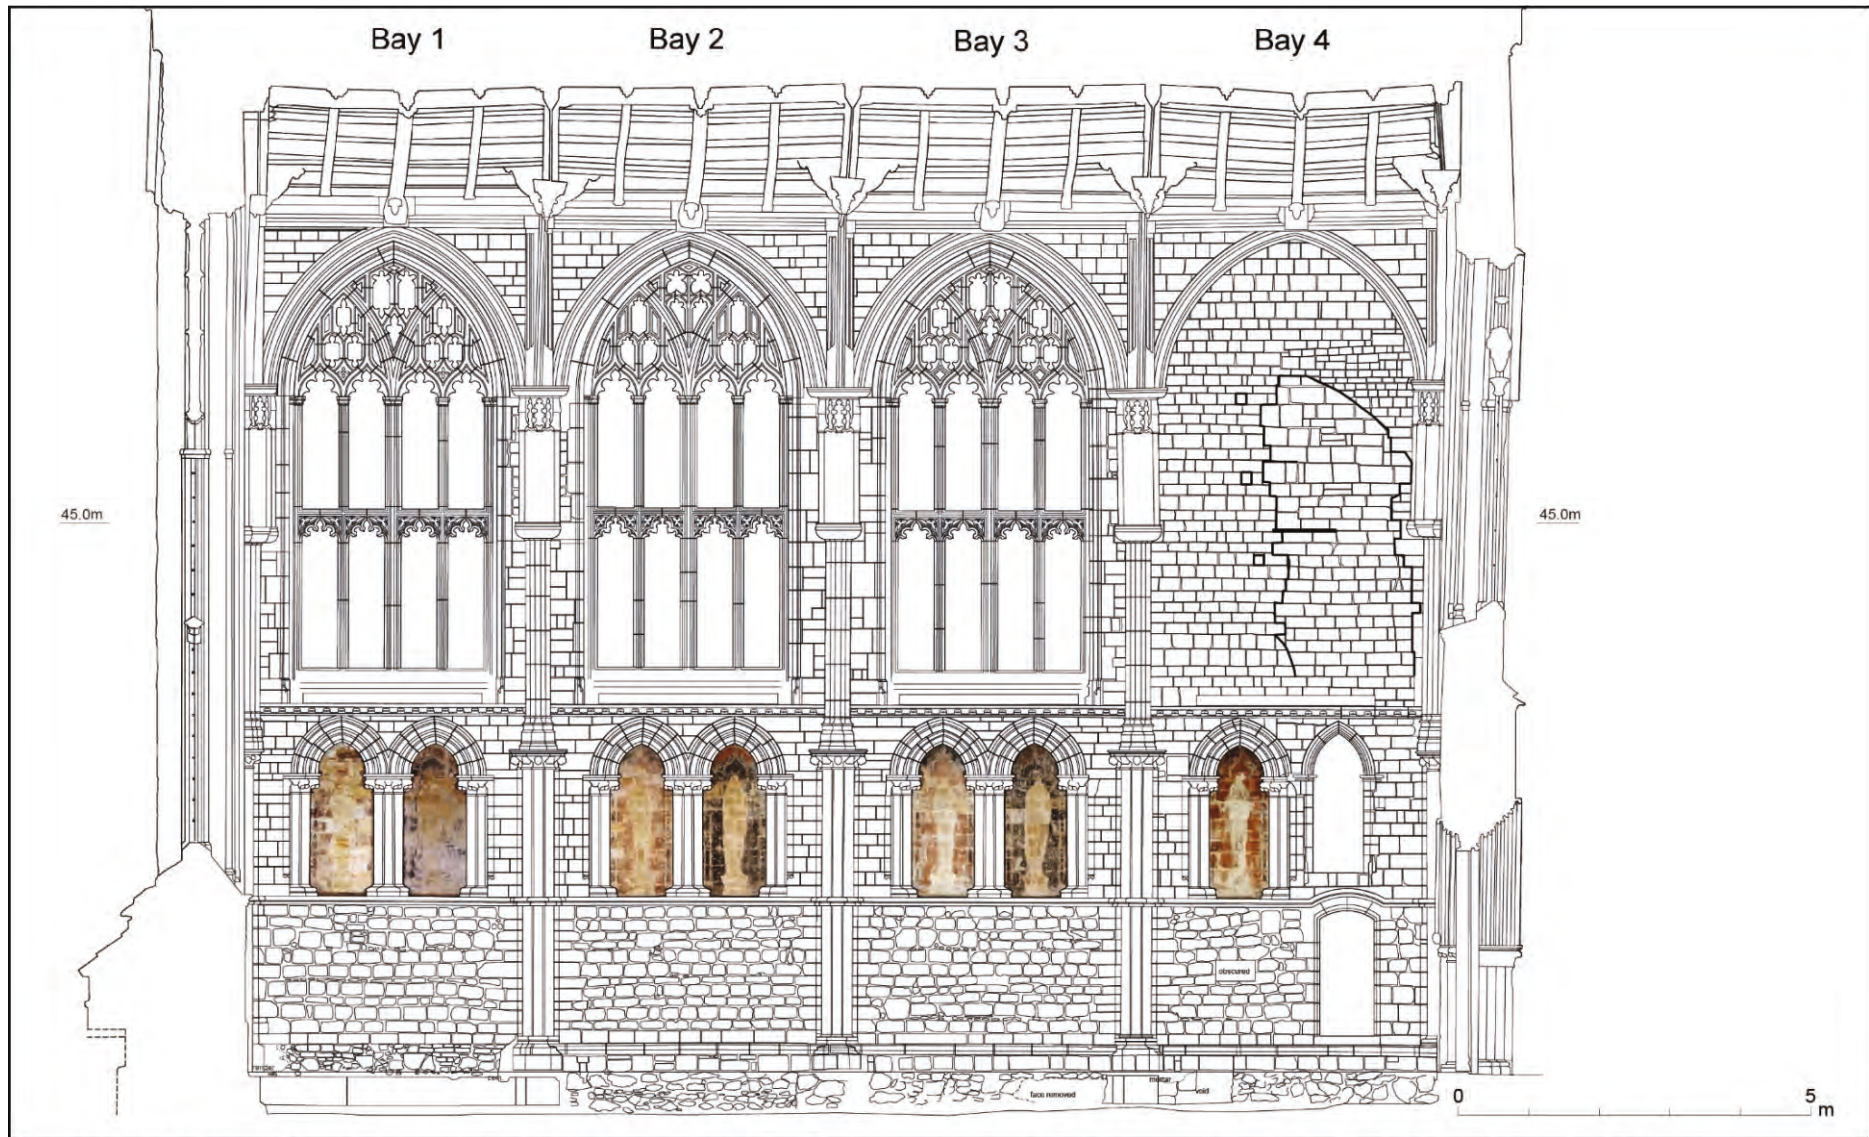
The Chapter House, internal face of the south wall: the Downland survey, with paintings concealed in 1975 and minor additions/corrections 2021 (RCHME 1975/Downland/T. Ives).
